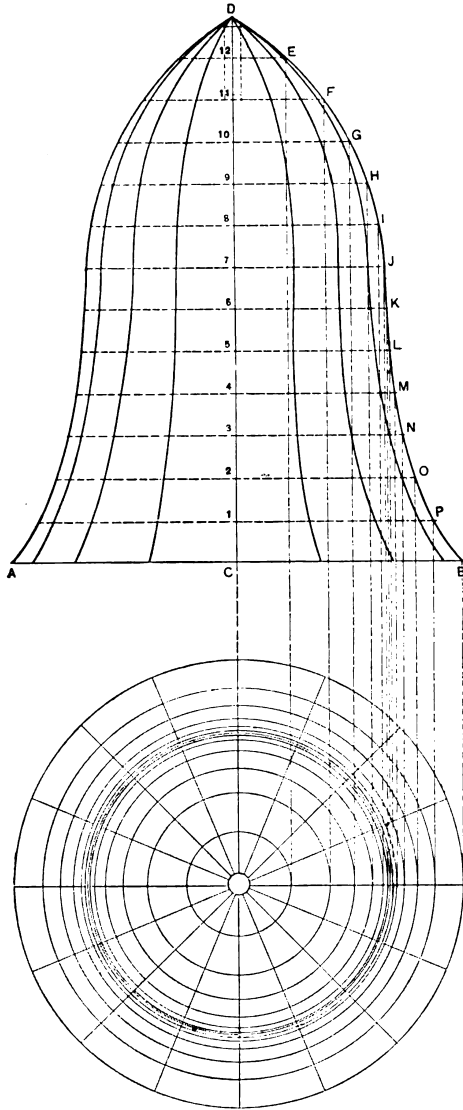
Outline Plan and Elevation of Rafters and Ribbing Sweeps.—Scale, 3/4 Inch to the Foot.
